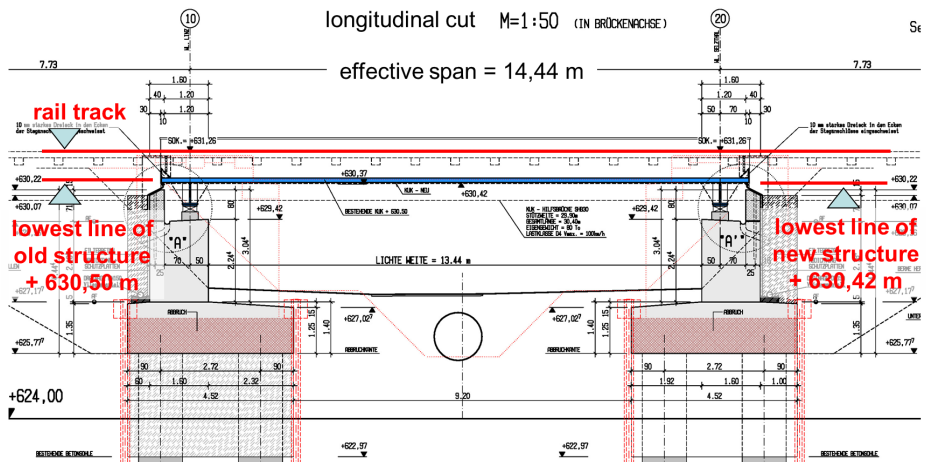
Longitudinal cut of new Brunngraben Bridge with given boundary conditions.
